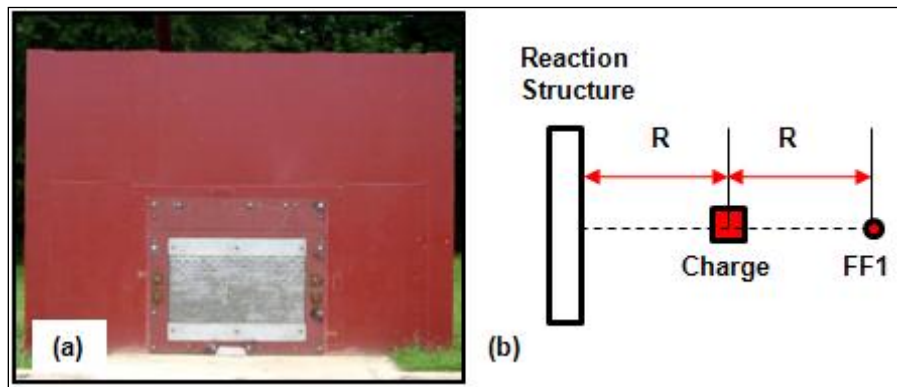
HE dynamic experiments. (a) Subscale CMU wall in reaction structure at BBTS. (b) Test site layout at the BBTS (plan view).
